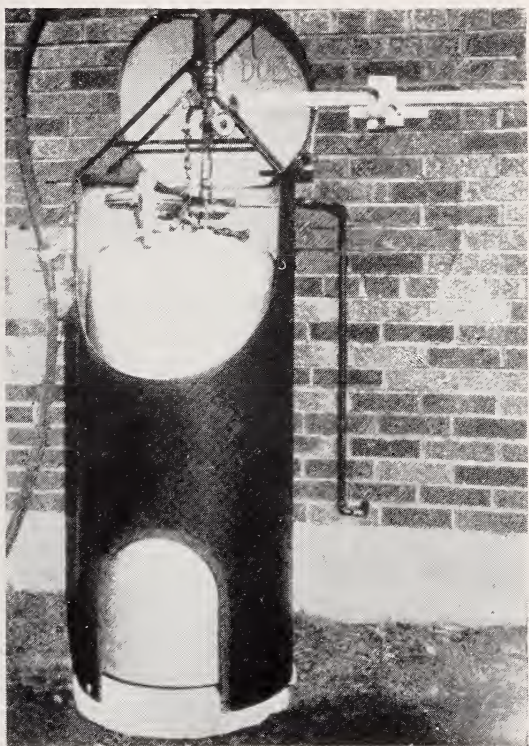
Single-cylinder installation, showing method of weighing cylinder contents.
